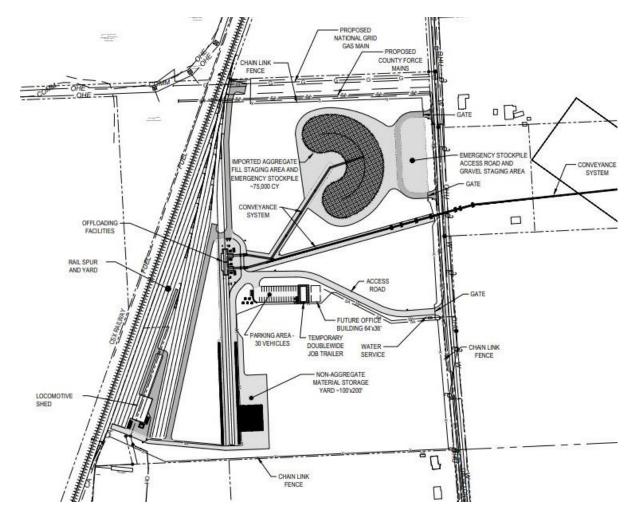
PROPOSED RAIL SPUR SITE PLAN
